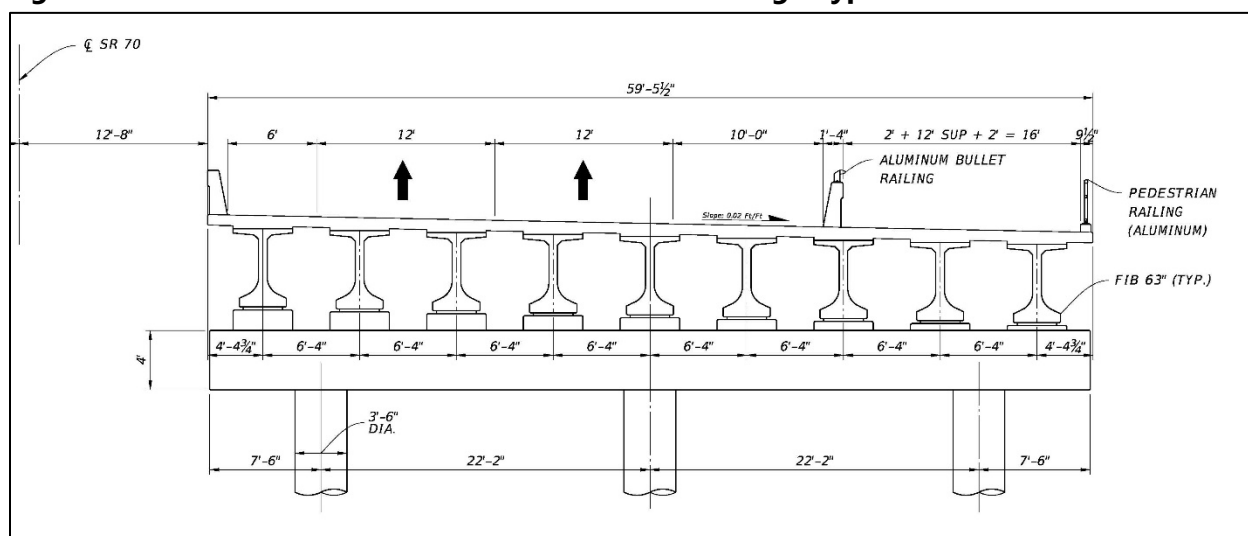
S.R. 70 over Kissimmee River Eastbound Bridge Typical Section
